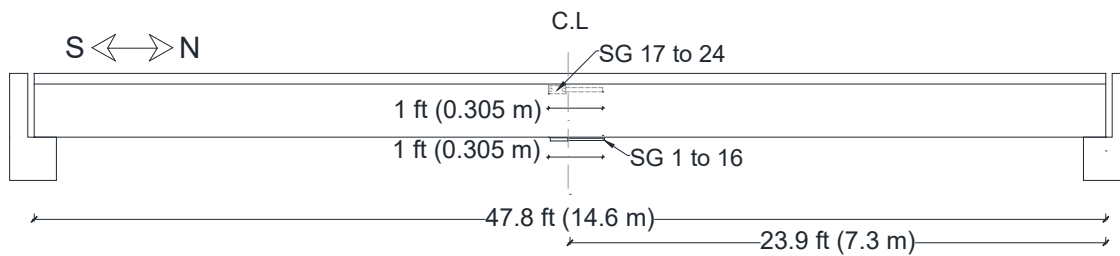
Girder Strain Gauge Instrumentation Plan for Flexural Response of 23-in. (584-mm) Deep Double-Tee Girder Bridge – Elevation View
